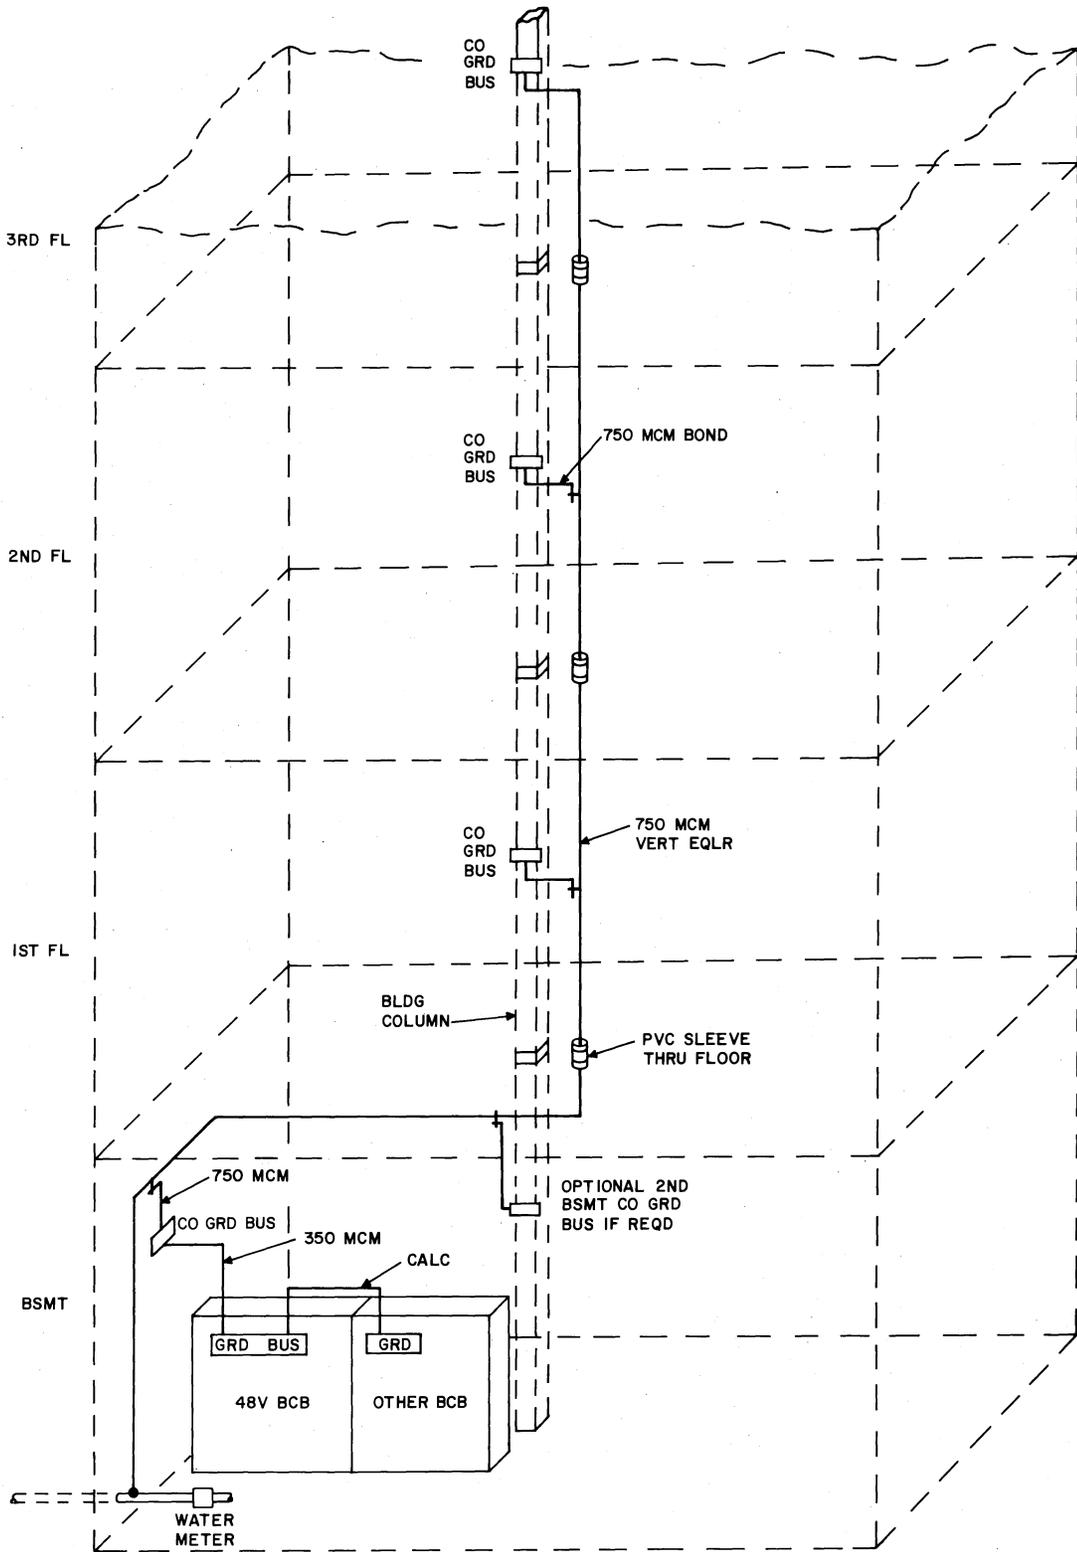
Typical Routing of Vertical Equalizer and Placement of CO GRD Buses in a Multifloor Building With Basement
